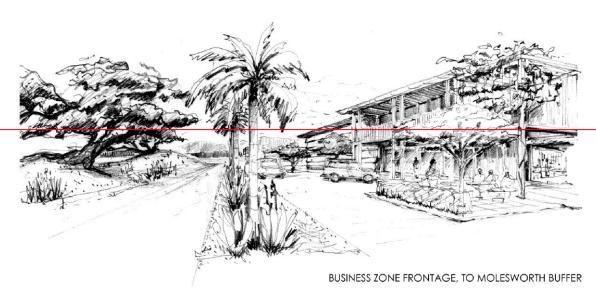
Artist impression of the central street of the Business Sub-Zone demonstrating the principles of active street frontages, shaded paved areas, planting in scale with the built form, continuous frontages broken into smaller elements, and on street parking.
